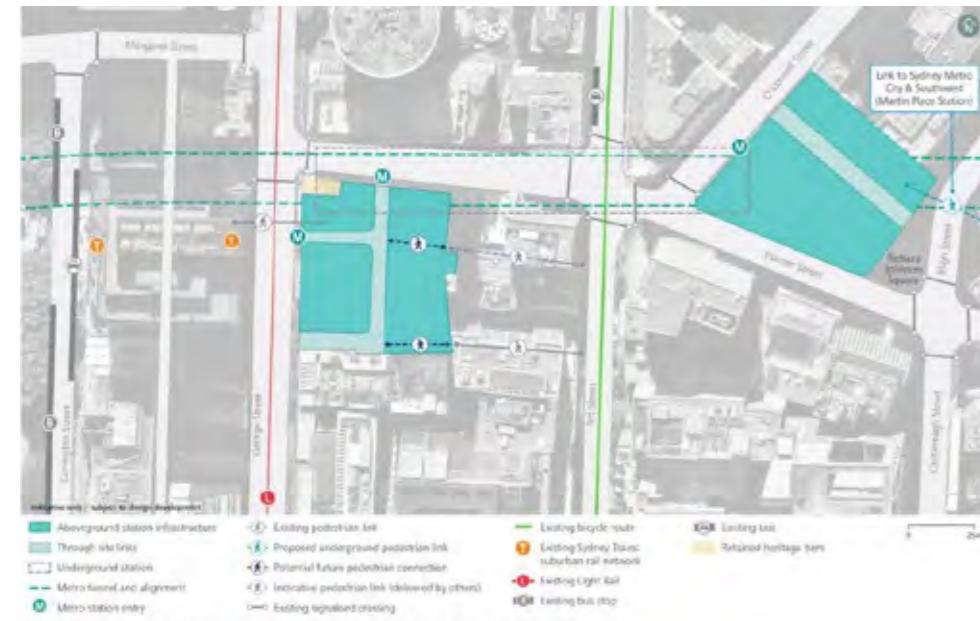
Indicative layout and key design elements – Hunter Street Station (Sydney CBD)
